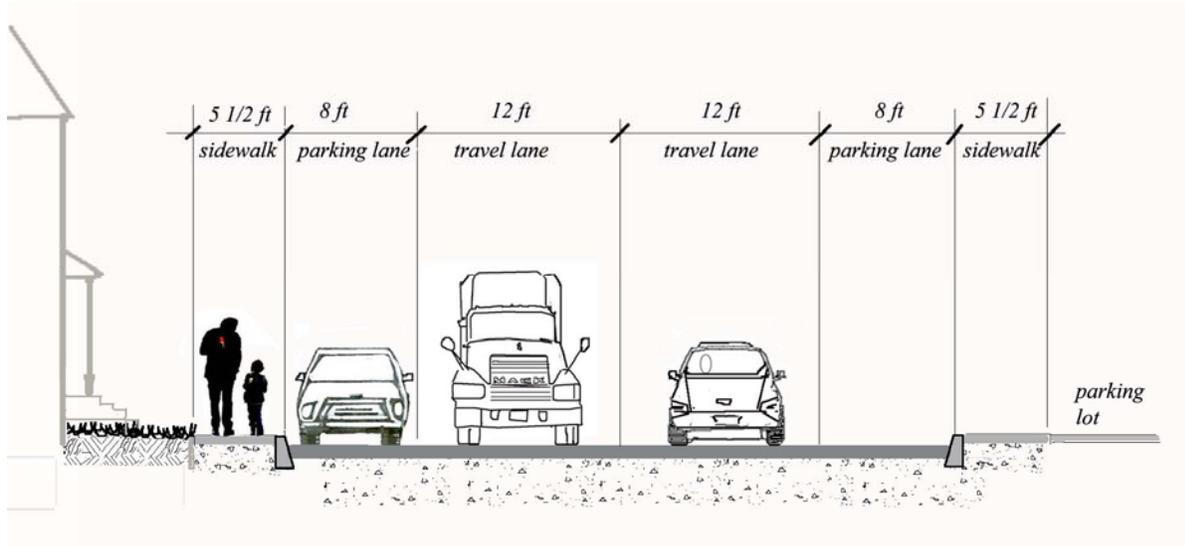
EAST MAIN STREET: EXISTING CROSS SECTION
